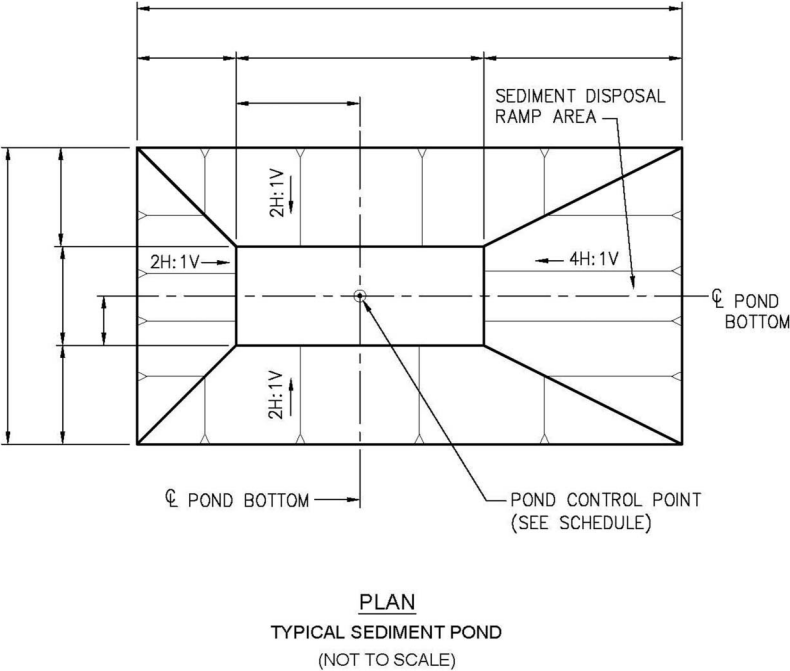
S-17. Dimensioning of Typical Sediment Pond
